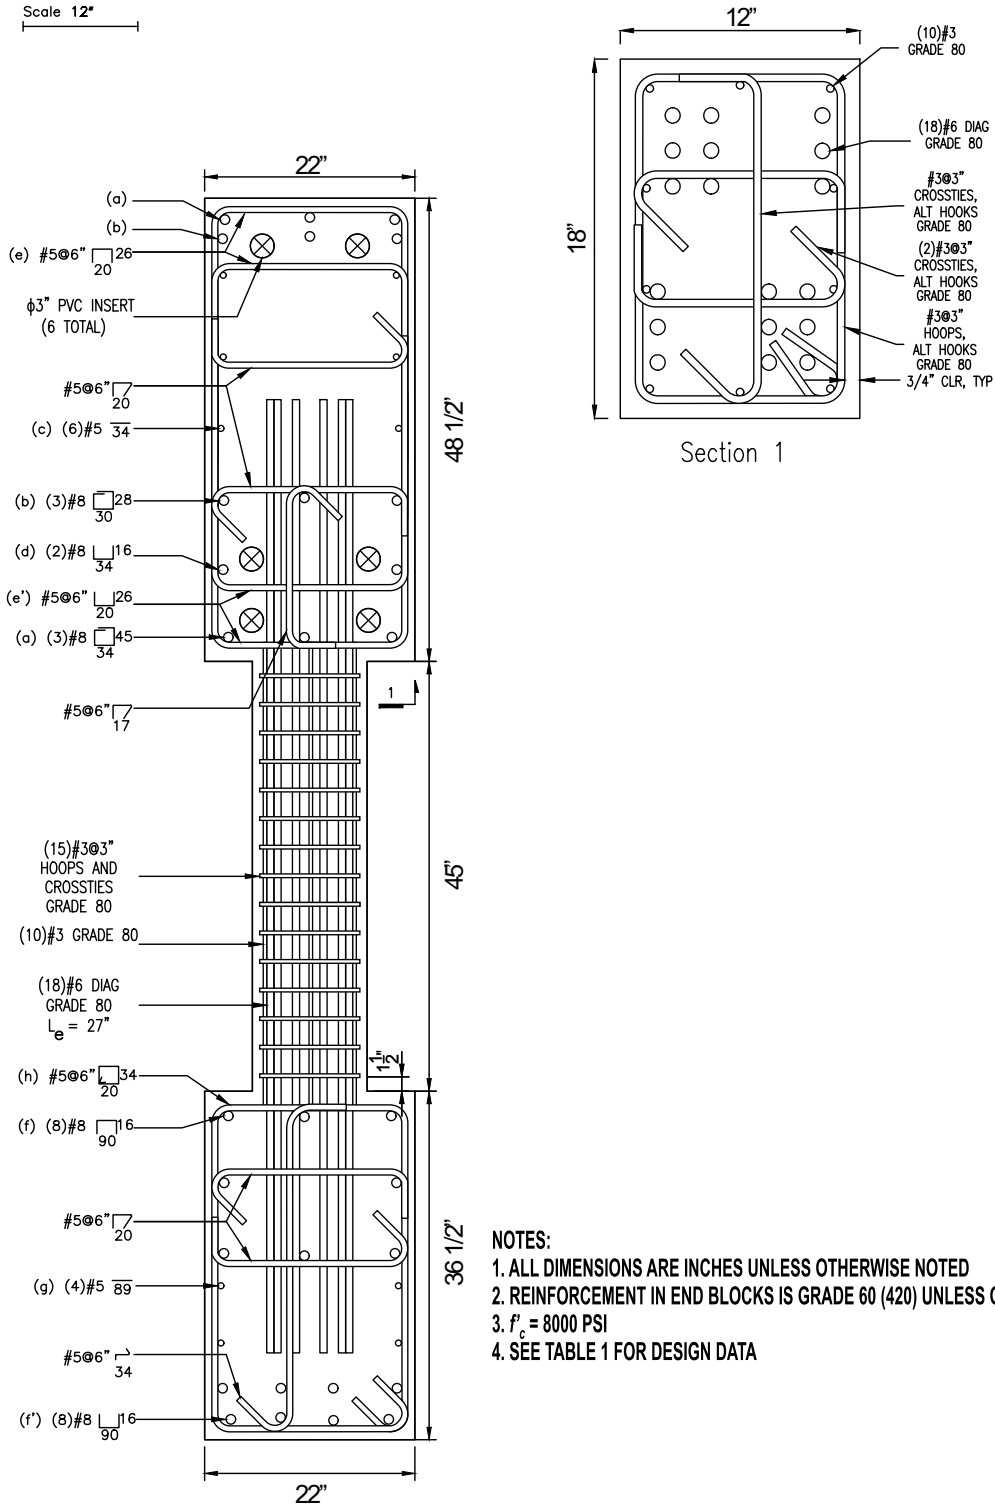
Elevation view of D80-2.5 (1 in. = 25.4 mm)
